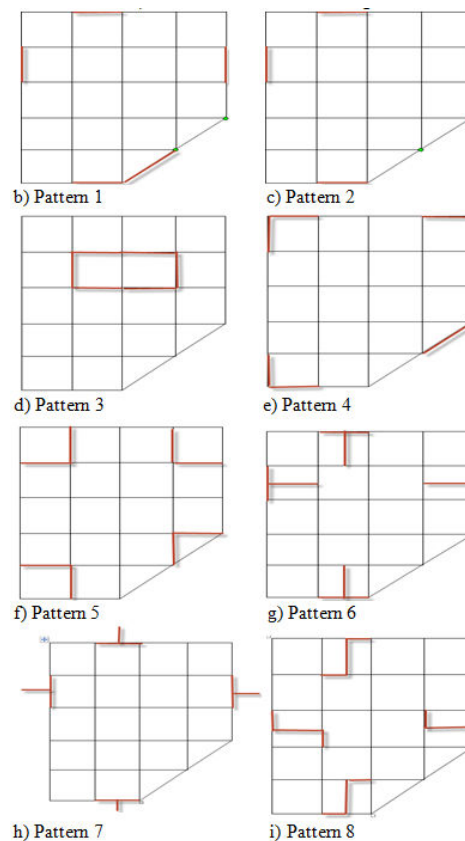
Vertically chamfered building and its eight various shear walls placement-shape patterns
